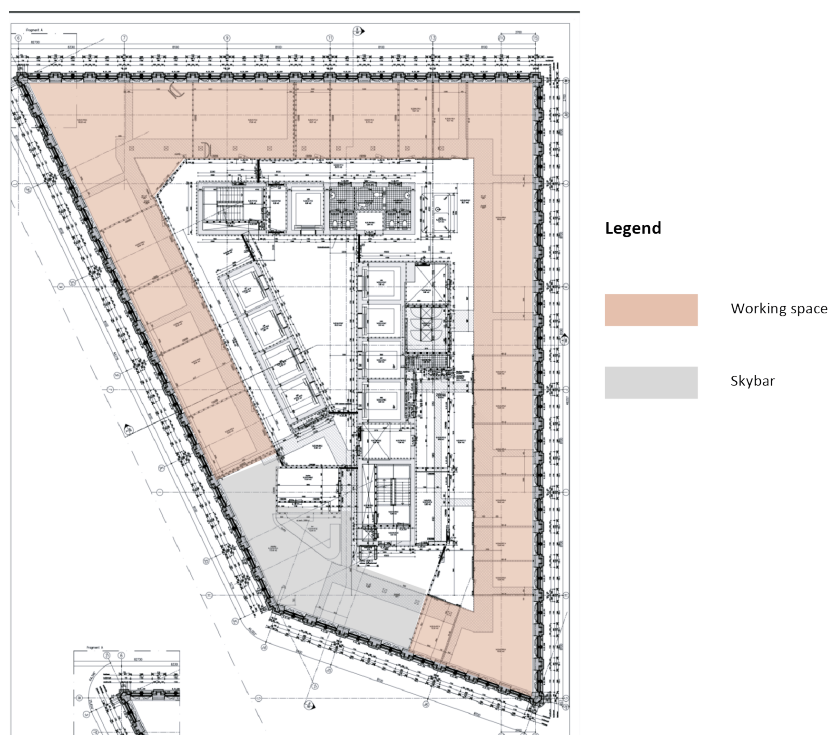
Floorplan 22nd floor JuBi towers and corresponding functions near the façade - south tower (BIM-model JuBi towers)
